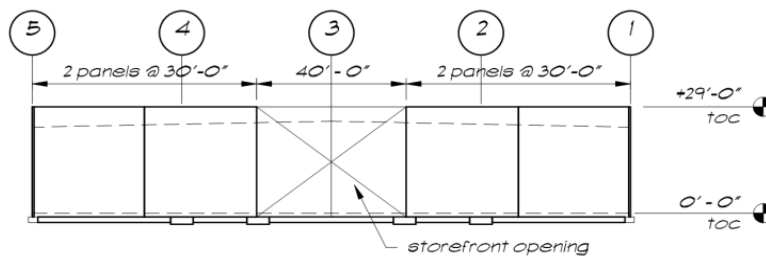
Elevation of north and south (side) walls of the retail building (all designs).
